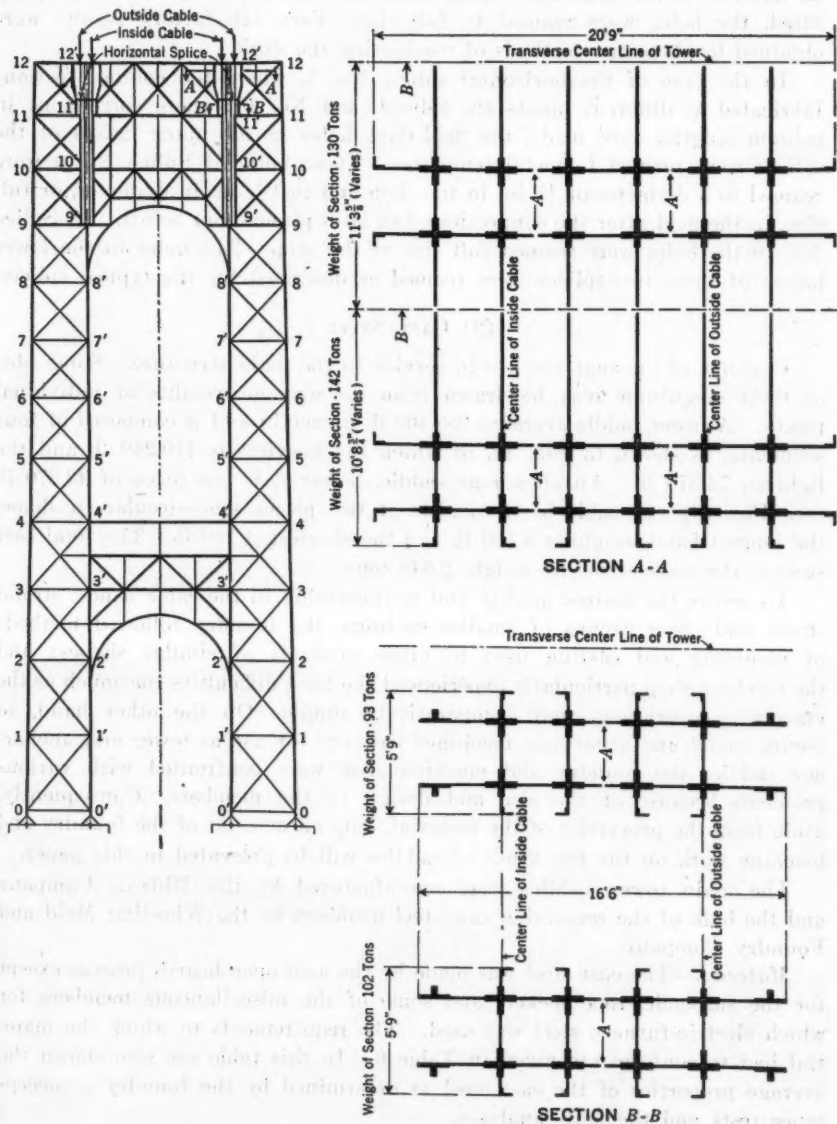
CROSS-SECTION OF UPPER COLUMN SECTIONS, SHOWING ASSEMBLIES FOR REAMING AND MILLING.
